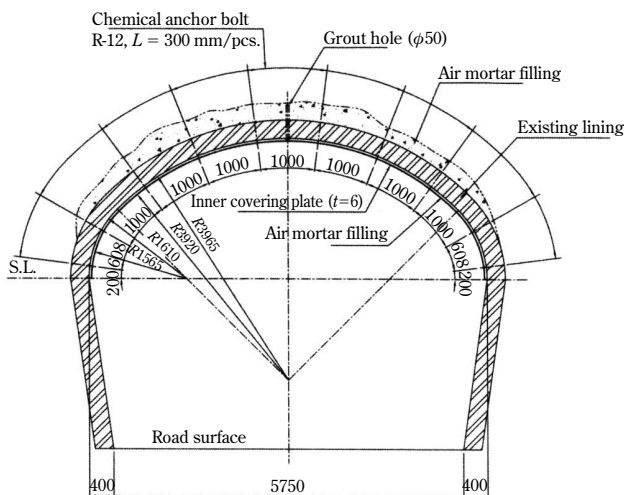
Cross-section of chemical anchor bolt type METAL-TUN
